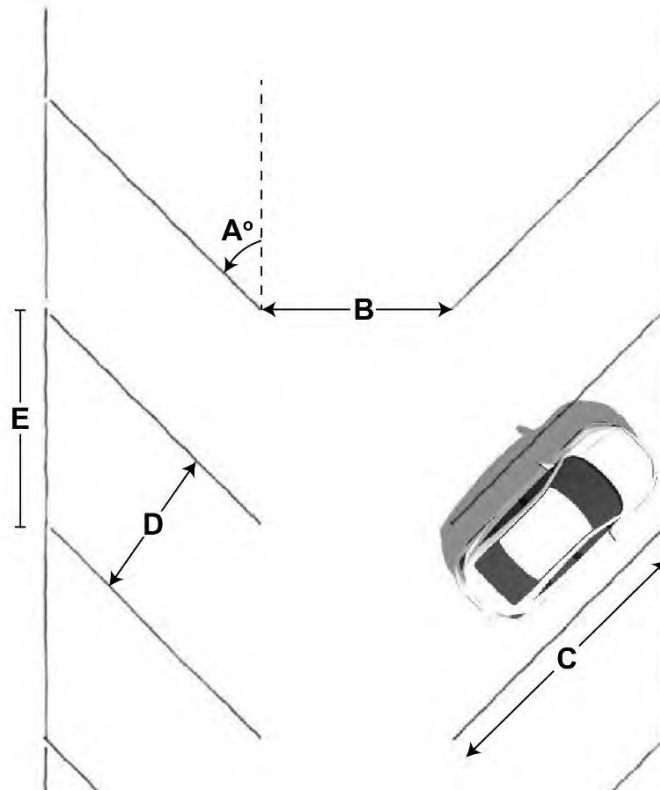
Minimum Dimensions for the Design of Parking Facilities
